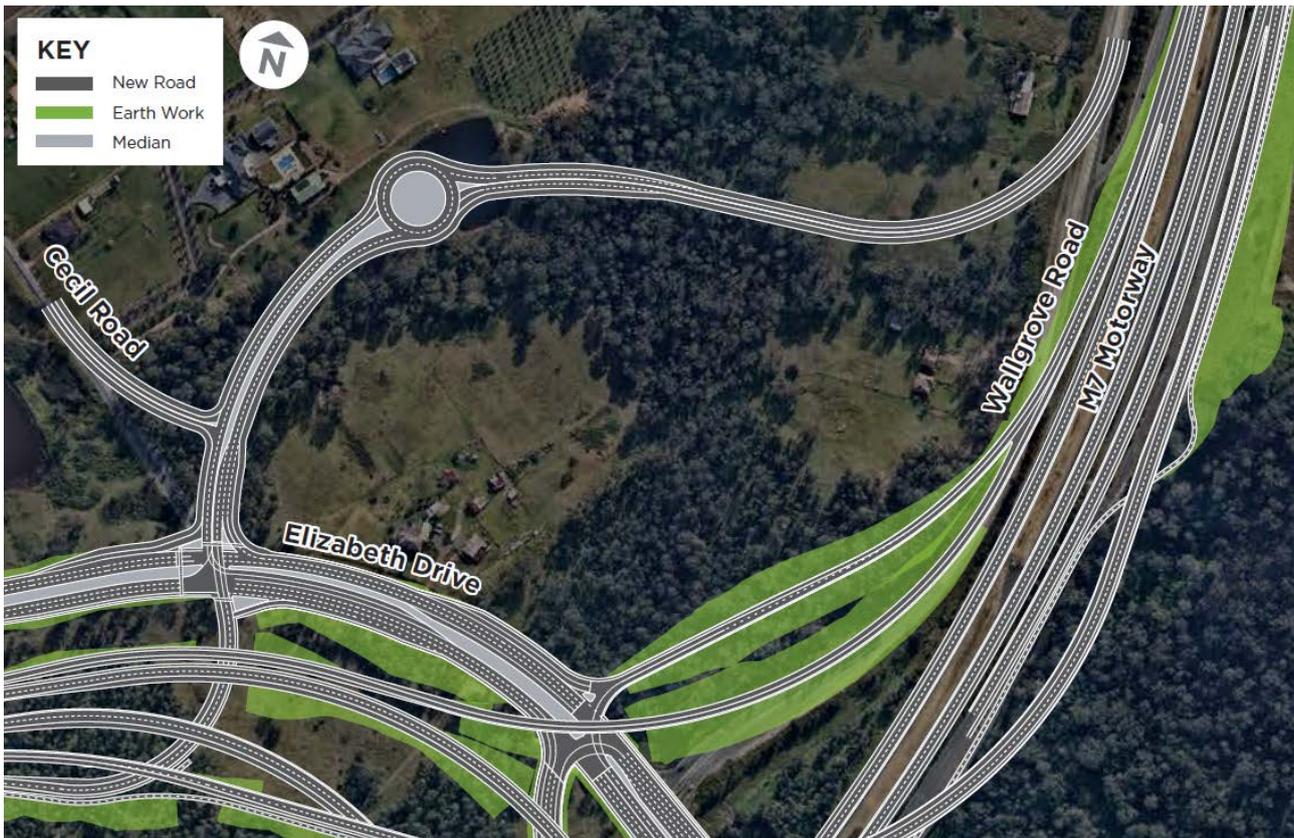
Option A - Left in left out intersection at Cecil Road and Wallgrove Road and relocated roundabout
